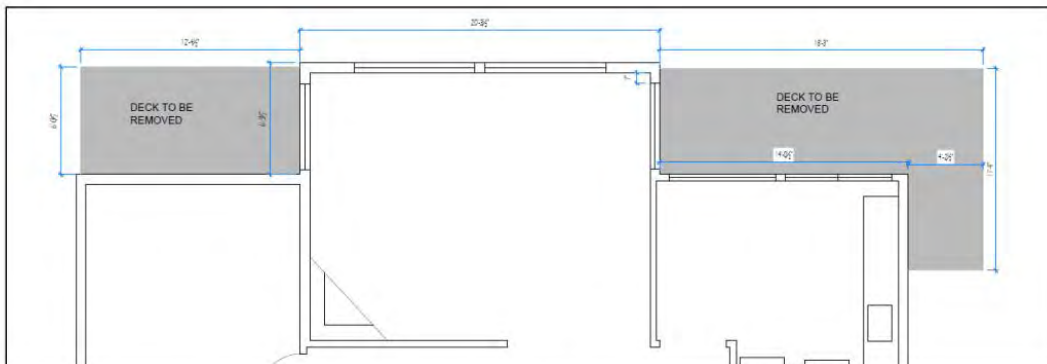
Aerial view of the proposed demolition of the existing decks. Drawings provided by Momentum Design Build.
